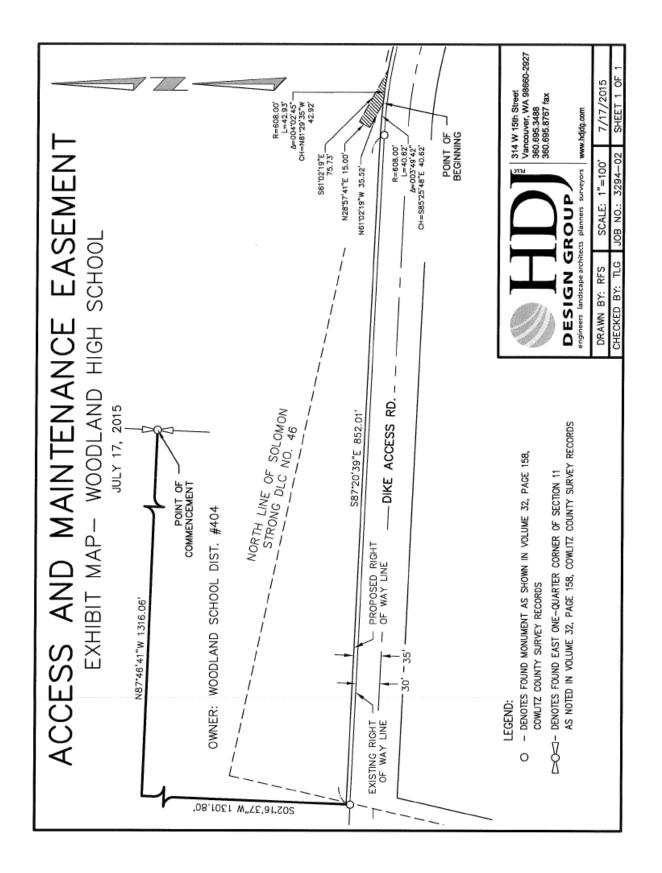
EXHIBIT E INSPECTION ACCESS EASEMENT NO. 1
